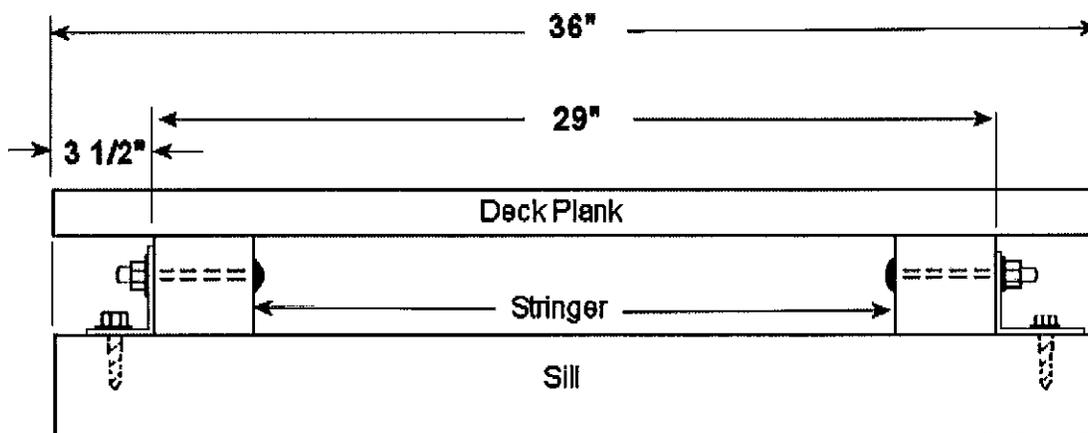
ACQ/FRP Lumber Sill Assembly Detail
